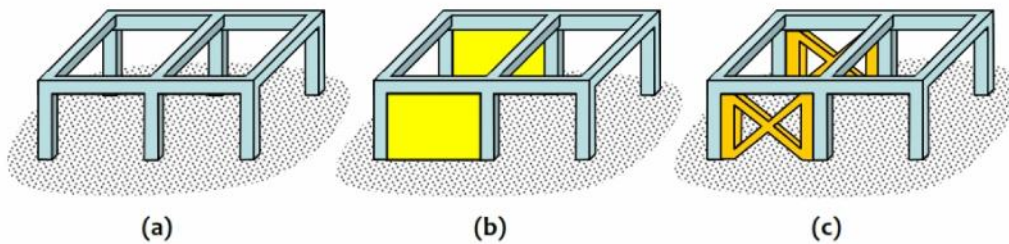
Common structural systems employed in buildings: (a) Moment frames, (b) Moment frames with structural walls, and (c) Braced moment frames. Walls and braces shown are shown only along one direction in plan; but designers can choose to provide them along both directions.
